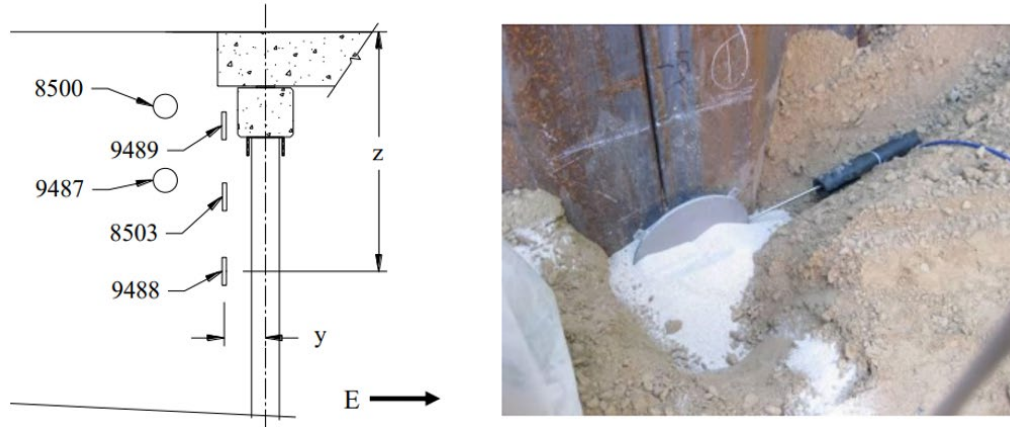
Installation of Earth pressure cells behind the sheet pile abutment (Evans et al., 2011).
